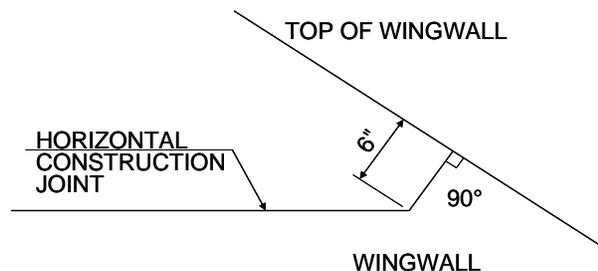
1 Horizontal construction joint in wing wall.
